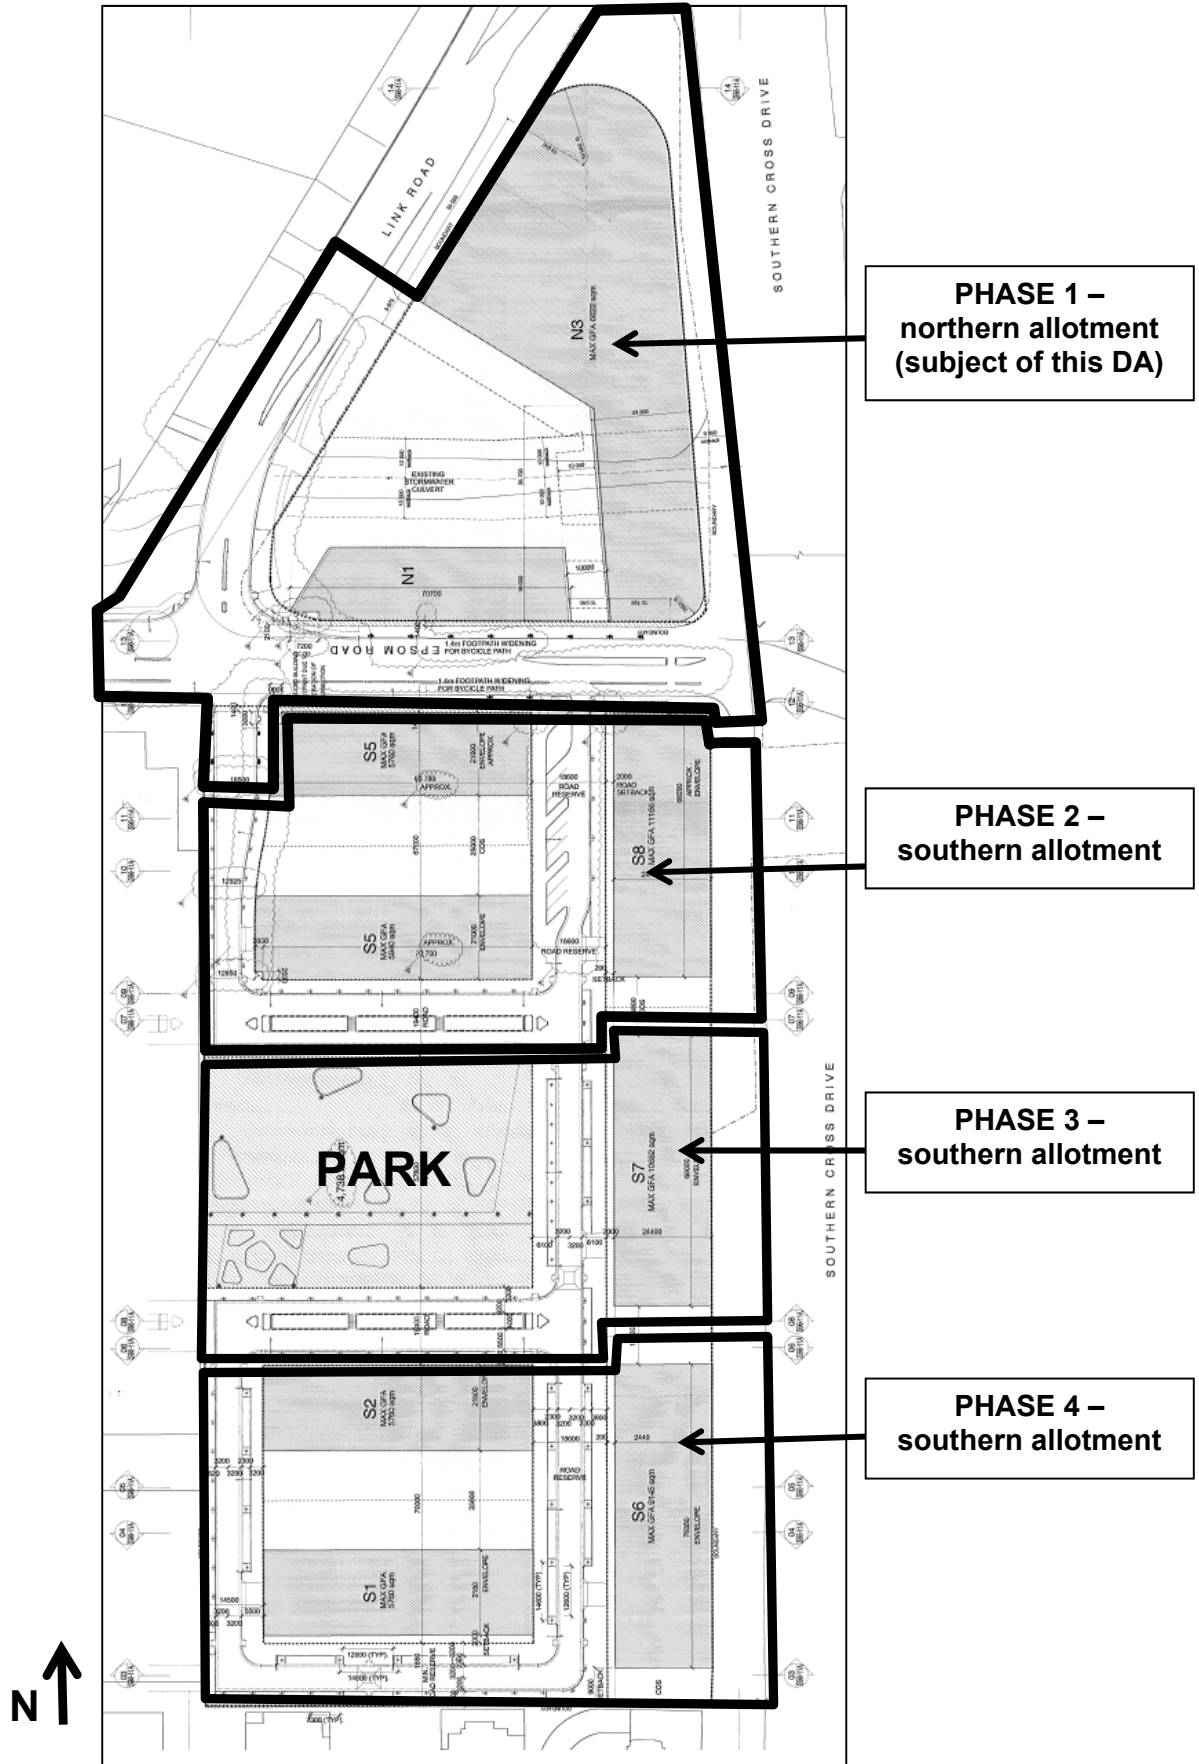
The approved locations of the 11 buildings pursuant to D/2005/1340
